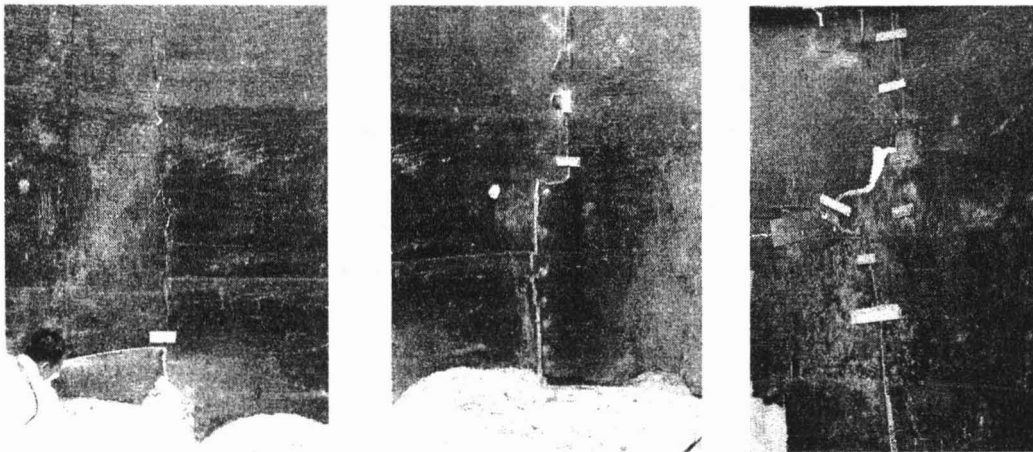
(a) Net Section Failure, (b) Inner Wall Fracture, and (c) Failure Caused by the Crash from Falling.
